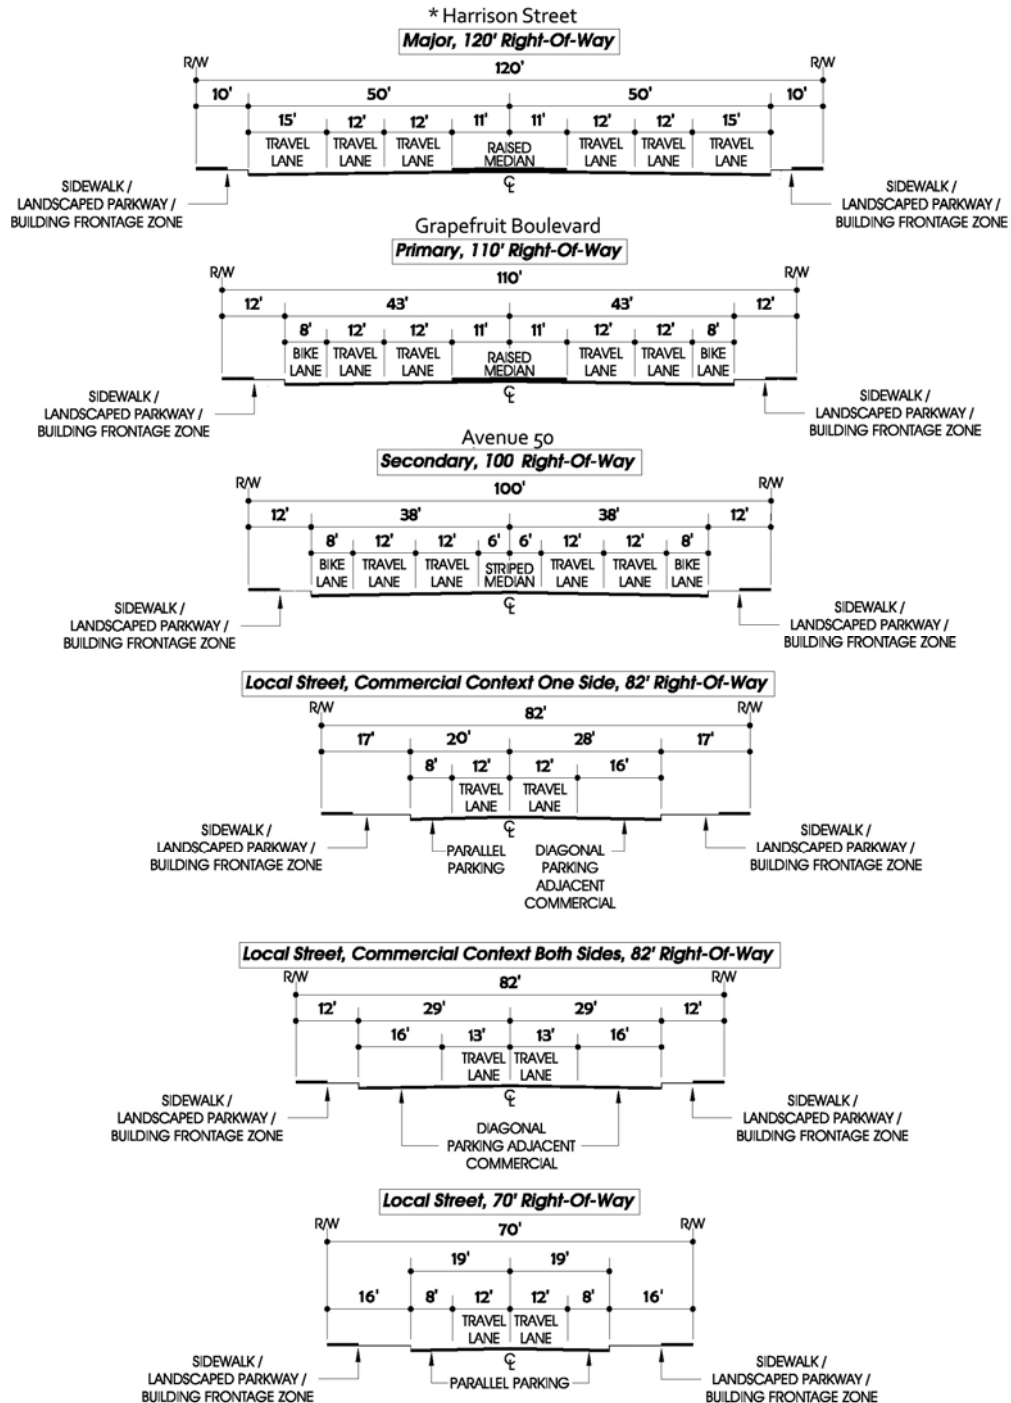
Pueblo Viejo Detailed Street Cross-Sections
